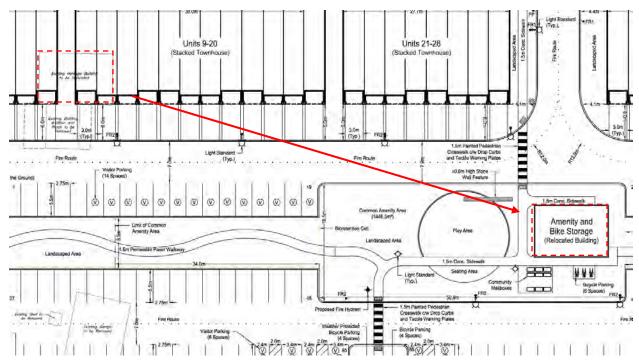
Detail of site Plan of the Proposed Development of the Subject Lands noting approximate existing location of heritage dwelling and proposed new location within the central amenity area (MHBC, 2023)
